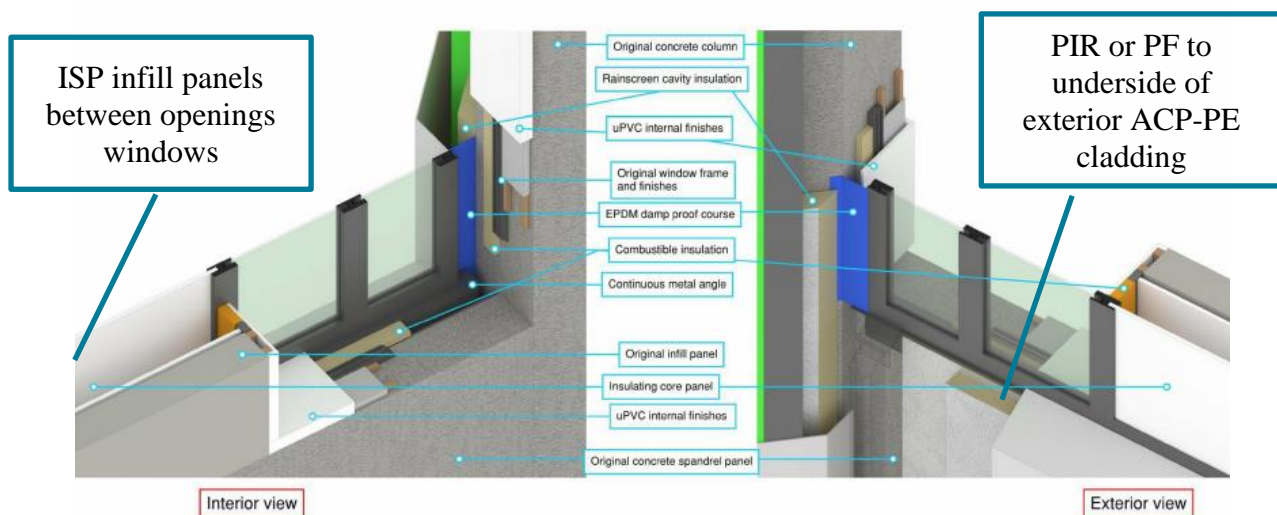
Interior and Exterior view of retrofitting works to the Grenfell Tower external wall
